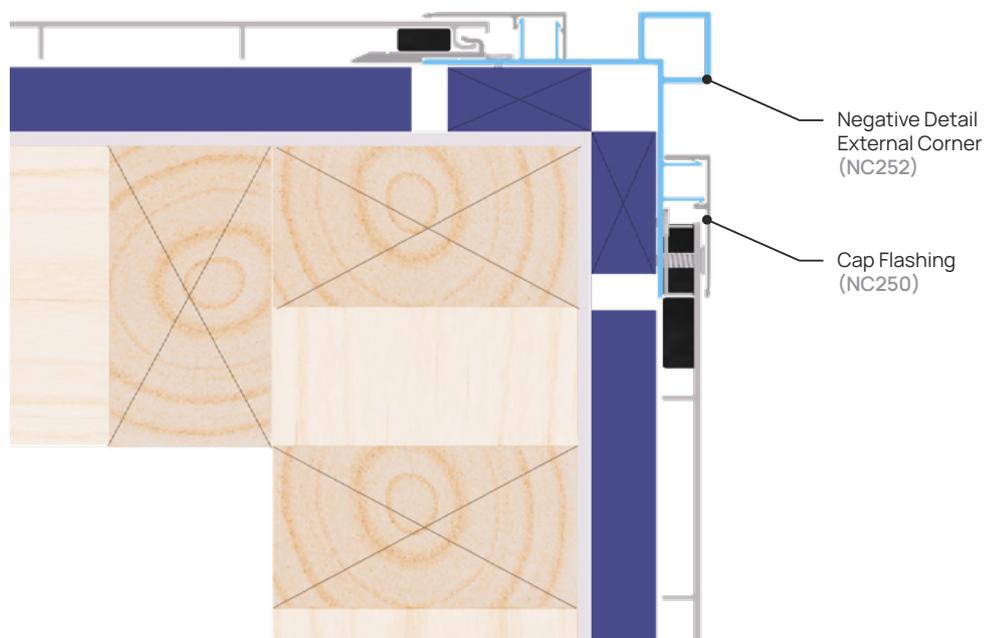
NEGATIVE DETAIL EXTERNAL CORNER FIXING
